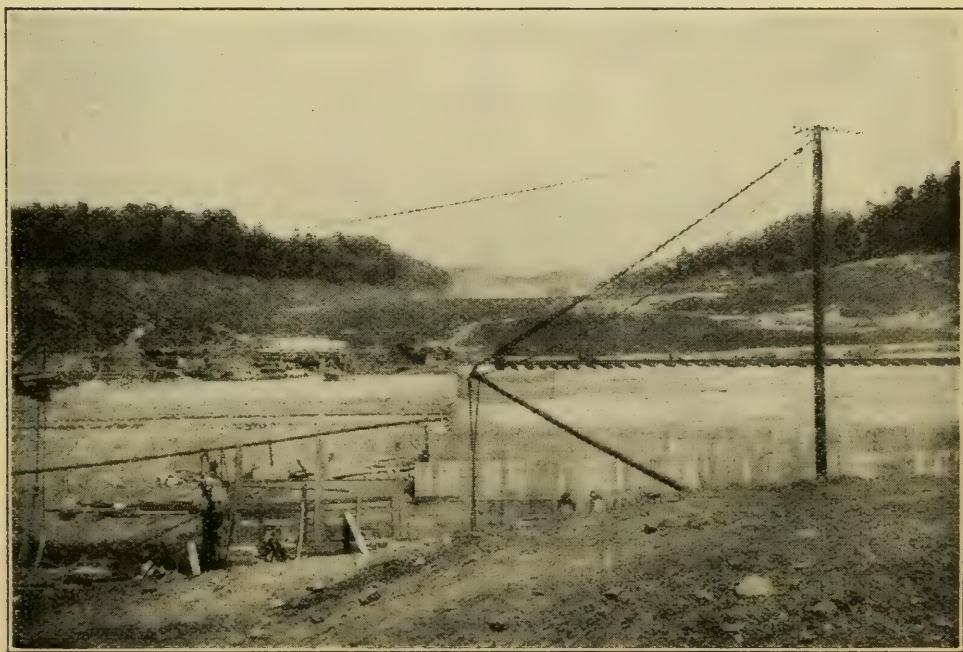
PARTLY COMPLETED CORE-WALL, HINCKSTON RUN DAM. LOOKING
